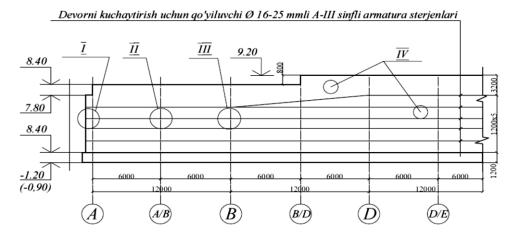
The scheme of strengthening the brick walls of the building with the help of pre-strengthened reinforcements
